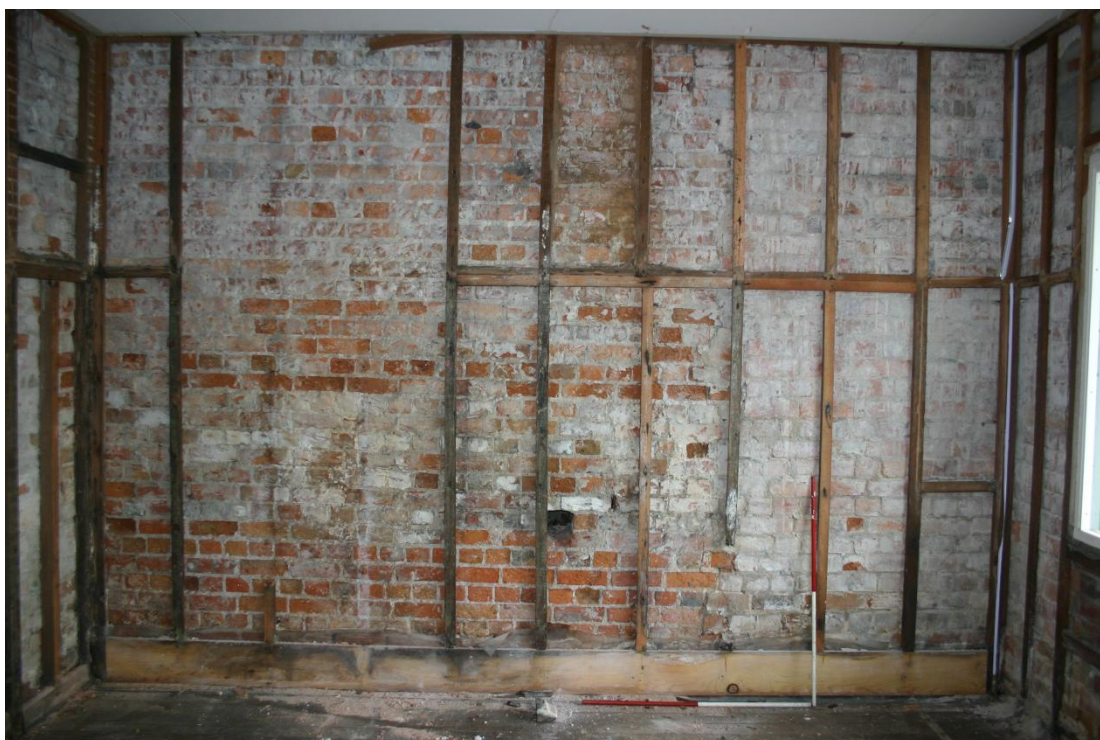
West wall in the west room of the 1902 Reception House building. Approximately 1m of this wall was new in 1902. The inferred c1820s wall is constructed in English-bond brickwork, the later c1902 wall is in so-called garden-wall bond (Sharp 1946 p.32).
